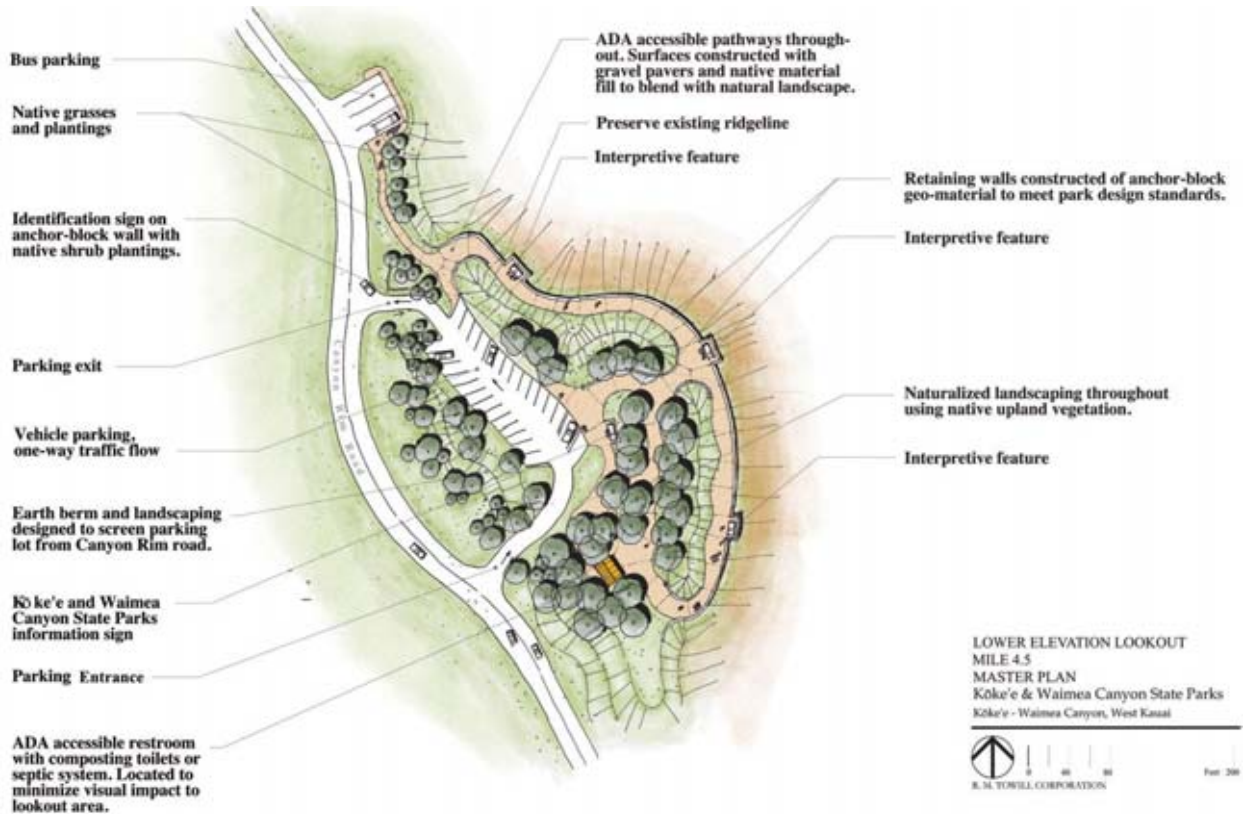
Lower Elevation Lookout (MP 4.5)
